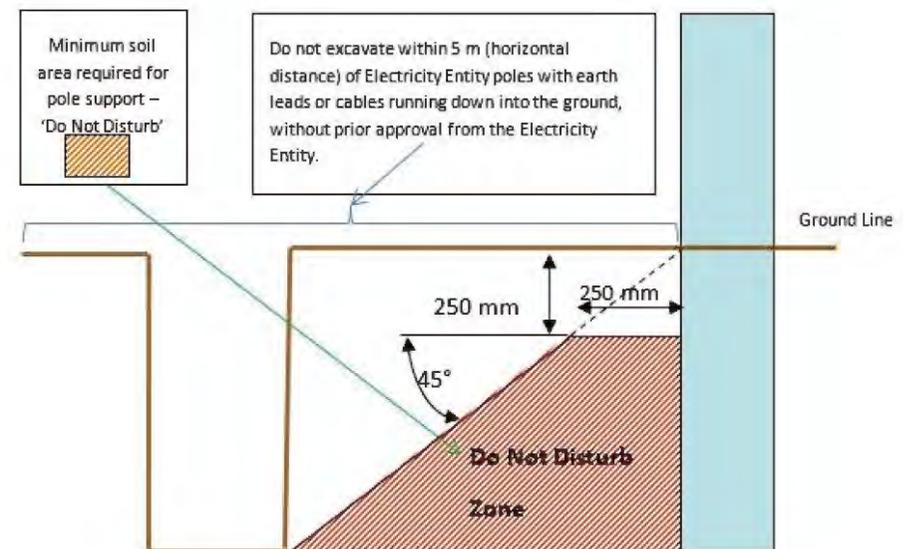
Do Not Disturb Zone requirements when excavating near poles
